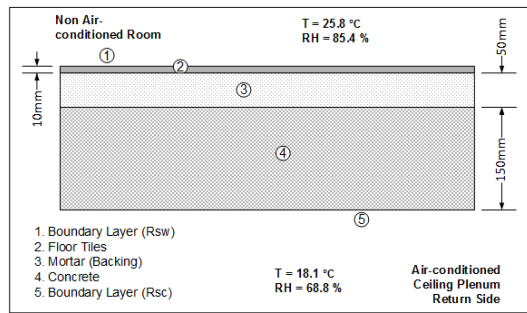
Existing Suspended Concrete floor above Ceiling Plenum Return space
